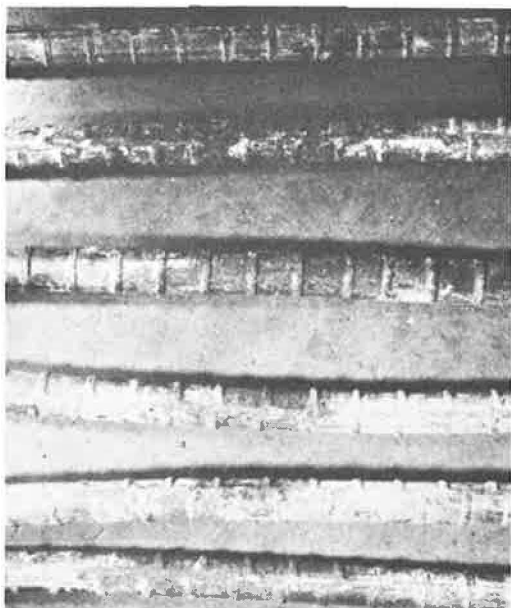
Condition of longitudinal reinforcement bars in the vicinity of transverse cracks.
